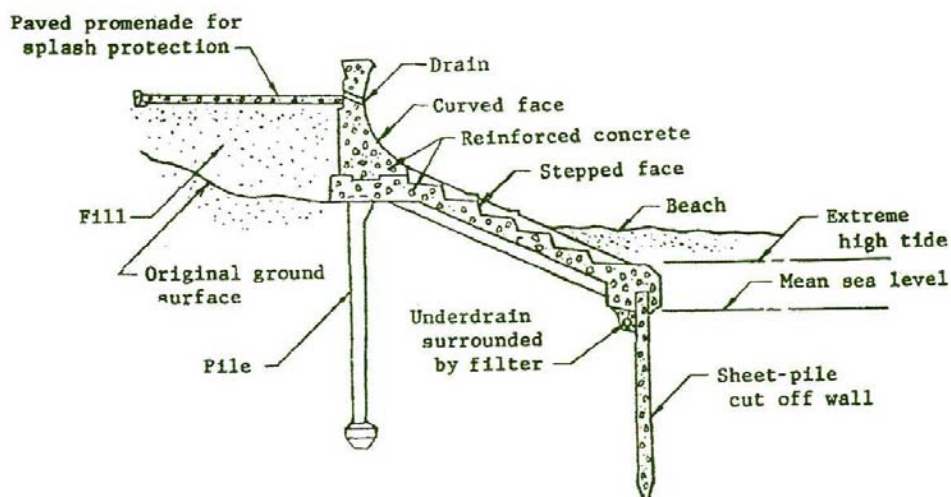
Reinforced concrete seawall with combination stepped and curved seaward face (U.S. Army Corps of Engineers, 1981)
